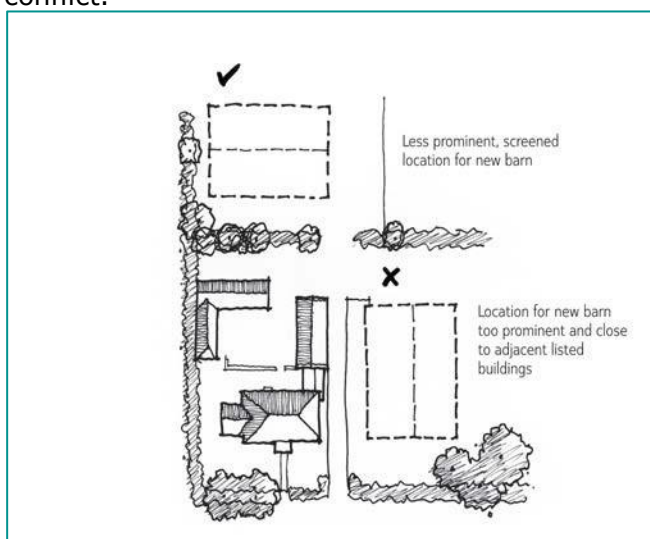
Good and poor examples of locating new buildings near listed and traditional buildings.
